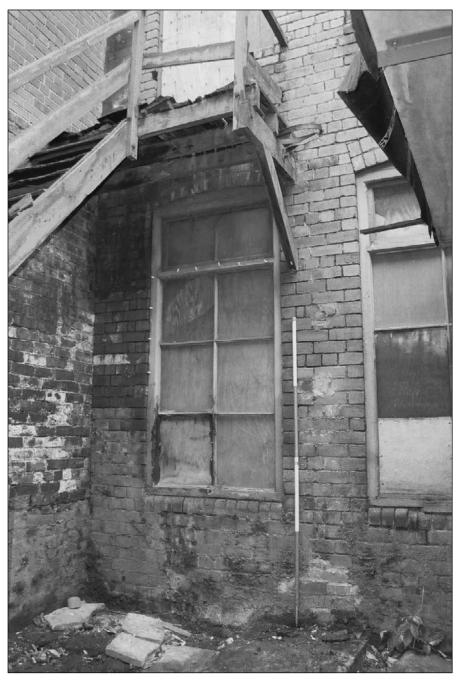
Detail of type 4 window and secondary timber external staircase, west elevation, north end of east range (film 2.20)
